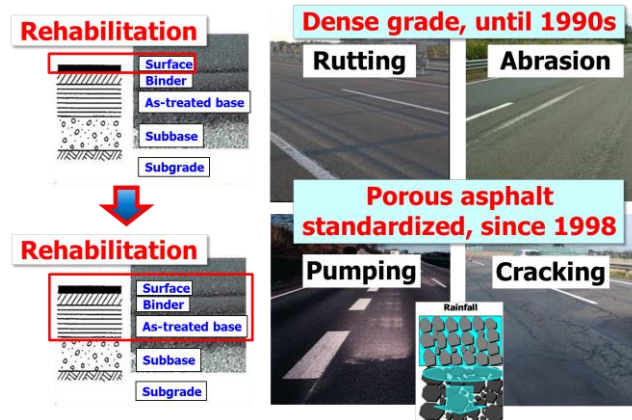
Pavement damage in dense-graded and porous asphalt pavements.
